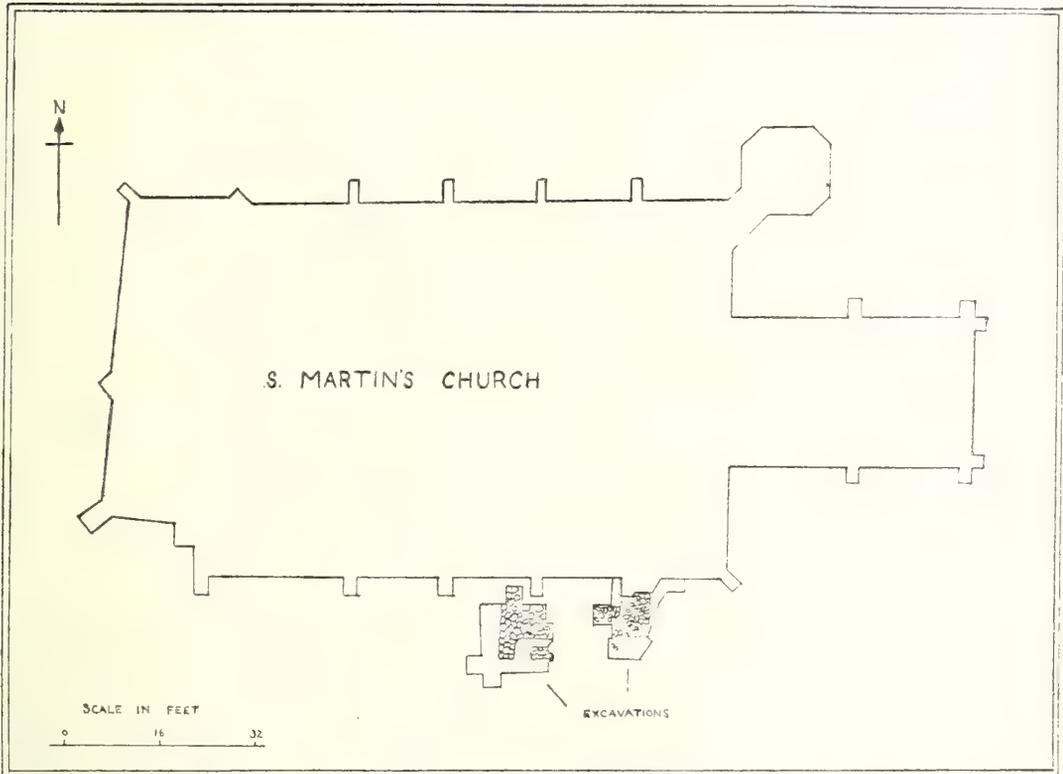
St. Martin's Church, Salisbury, showing site of excavations
